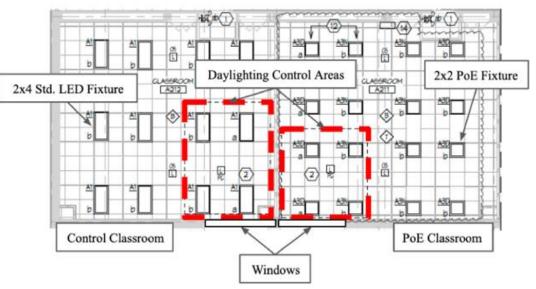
Floor Plan of the PoE and Control Lighting Systems in the SVMS Adjacent Middle School Classrooms.
